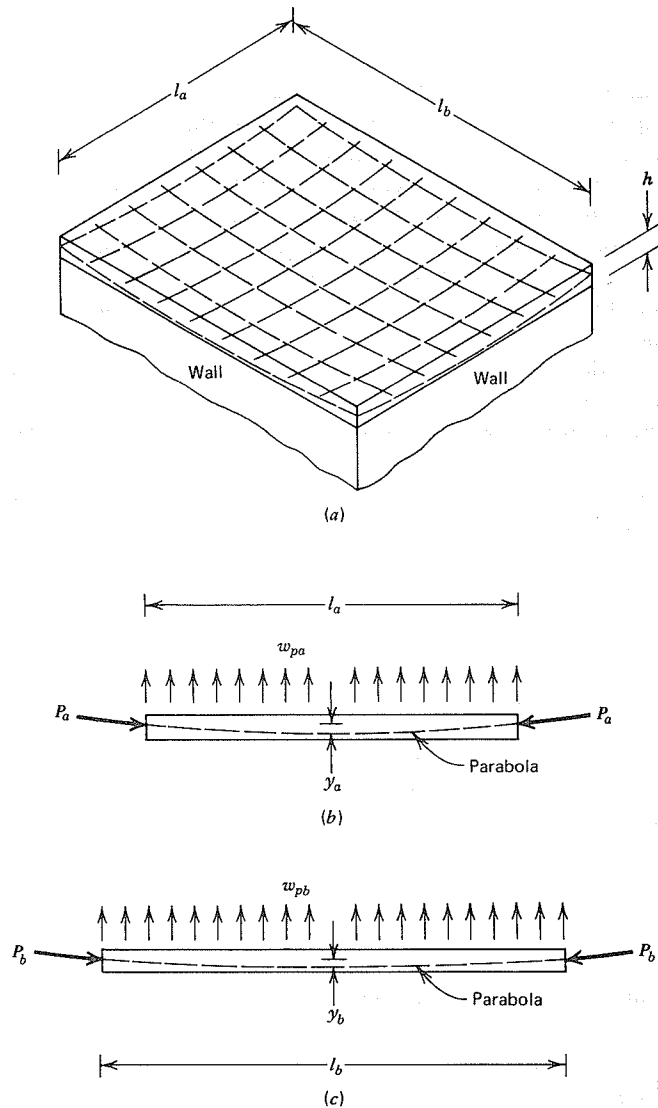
Wall-supported slab with two-directional tendon layout.
